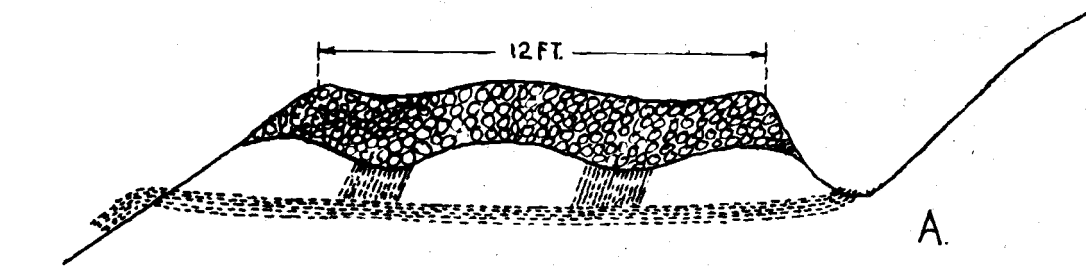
Cross-section of Narrow Road Showing Groove on Road Surface Made by the Constant Pounding of the Wheels.
